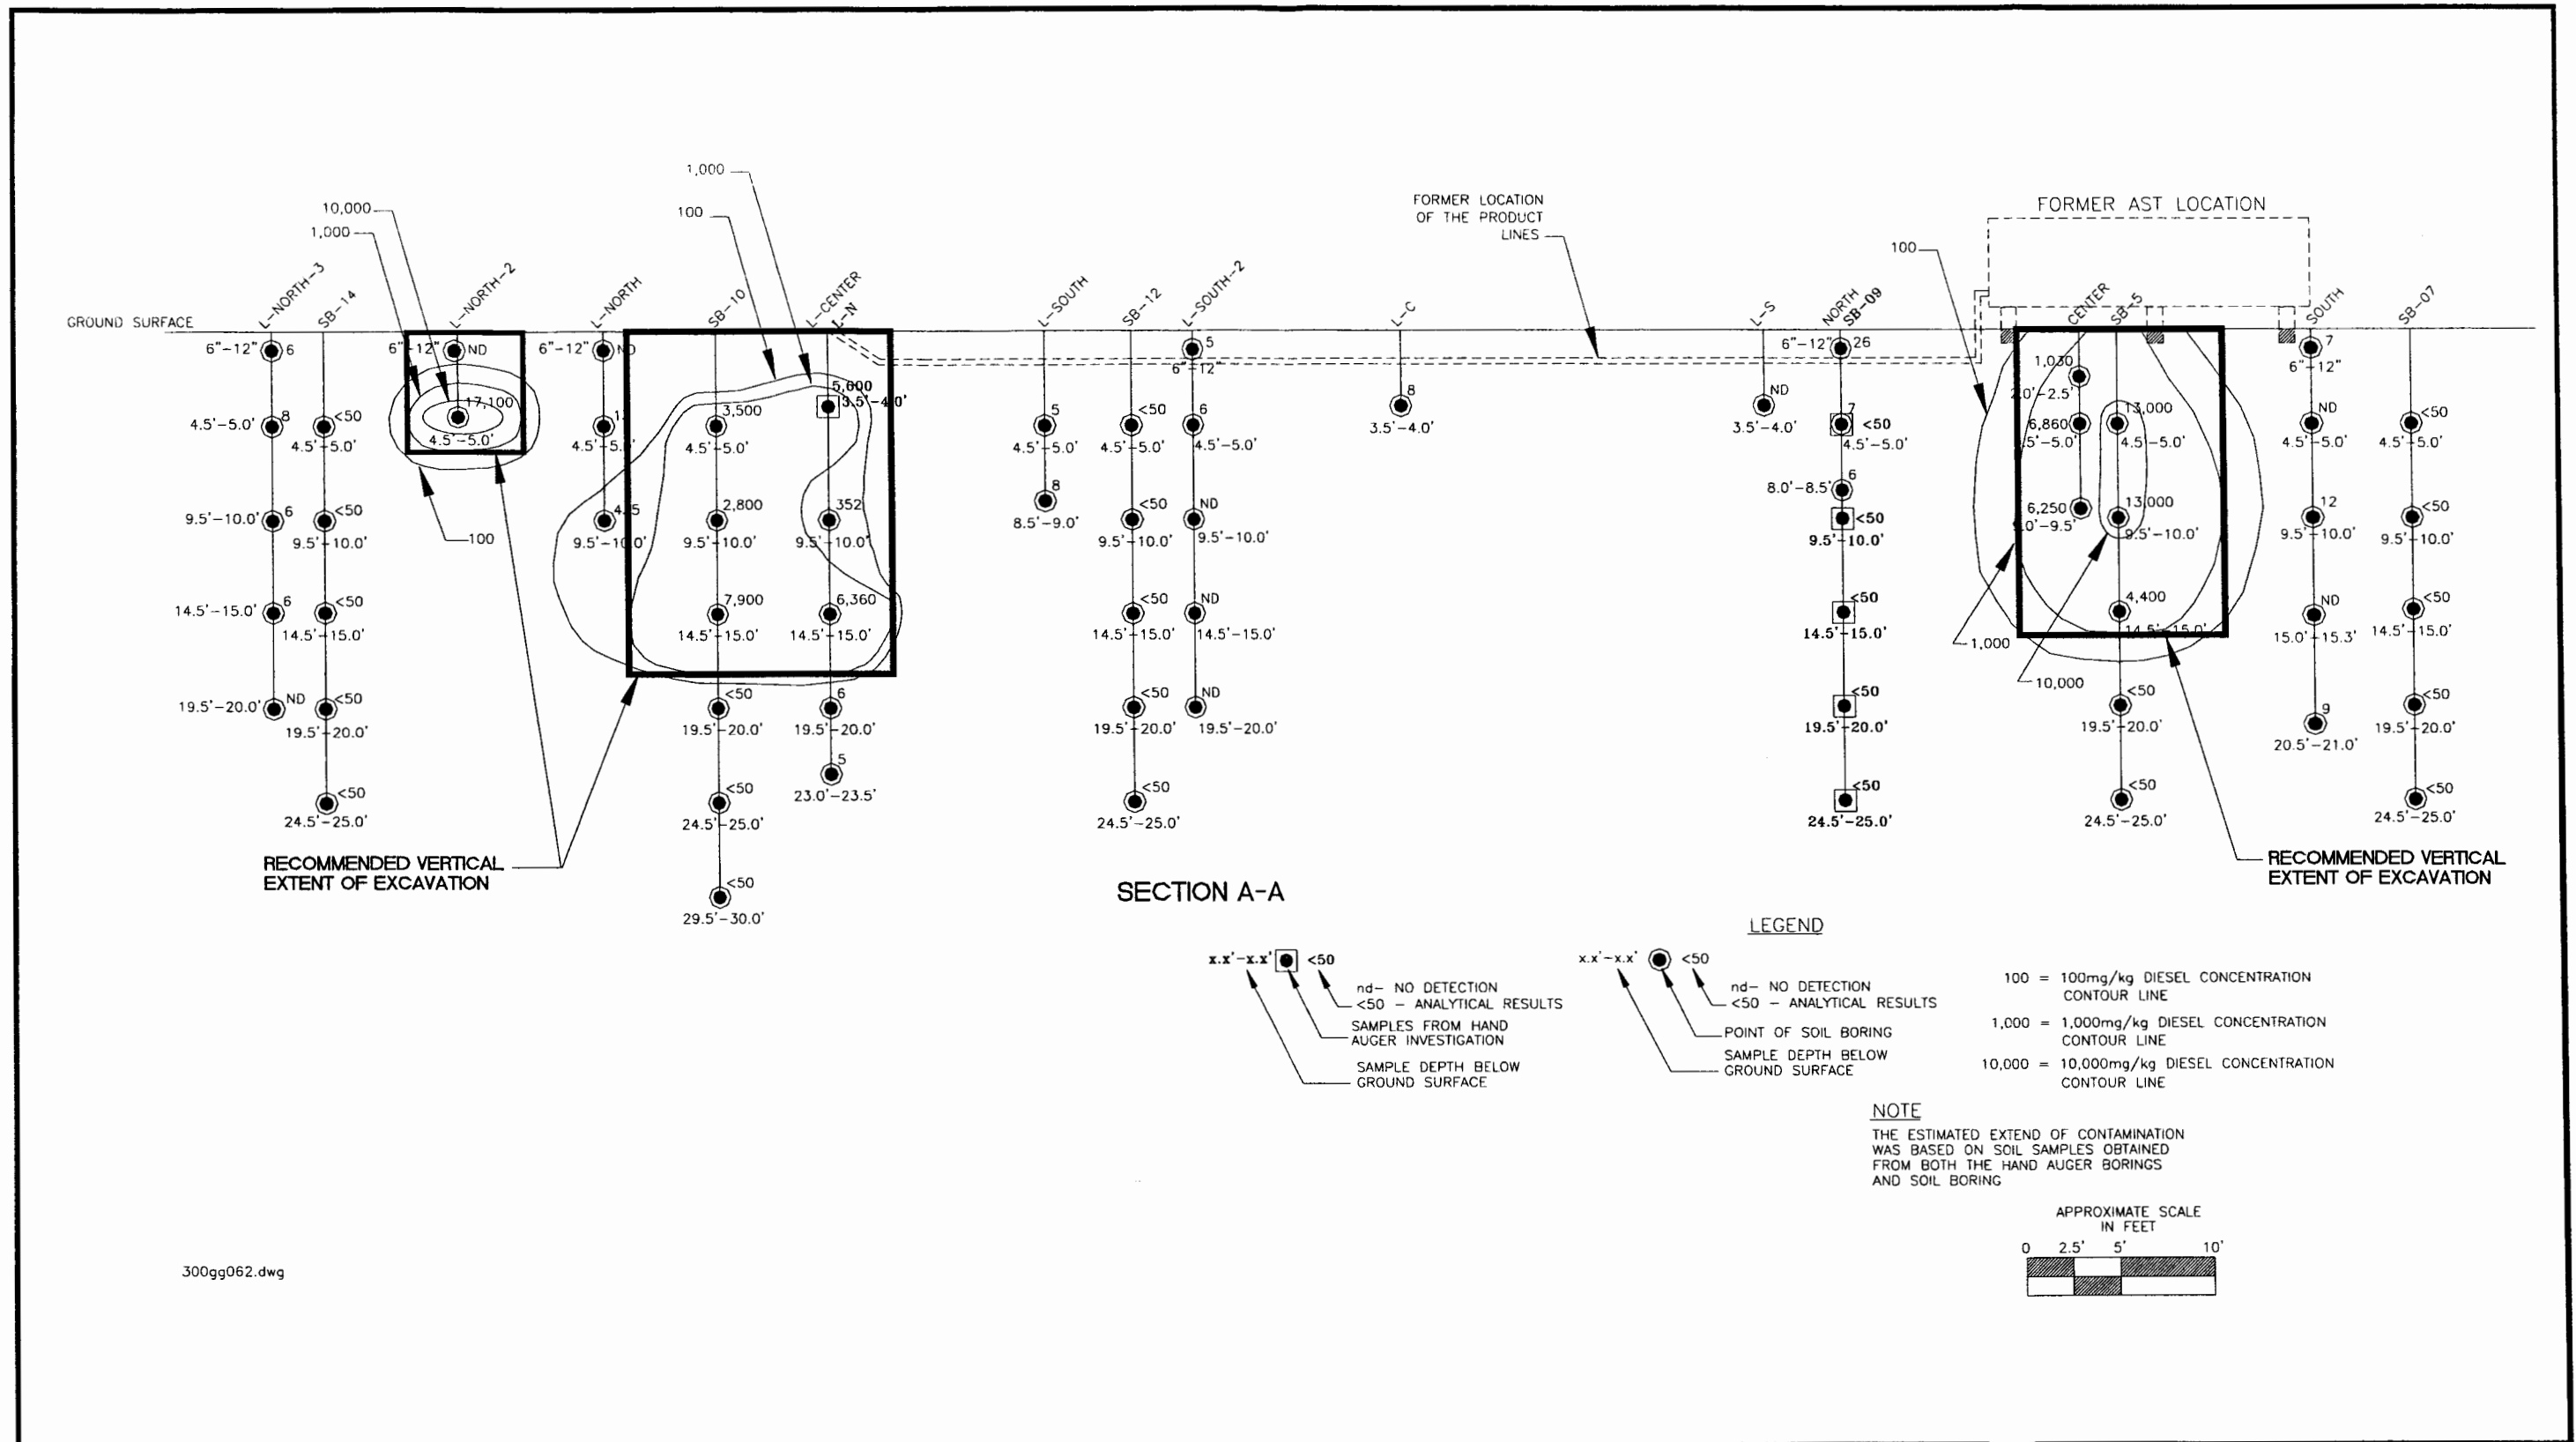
Recommended Vertical Extent of Excavation at Cross Section A-A
